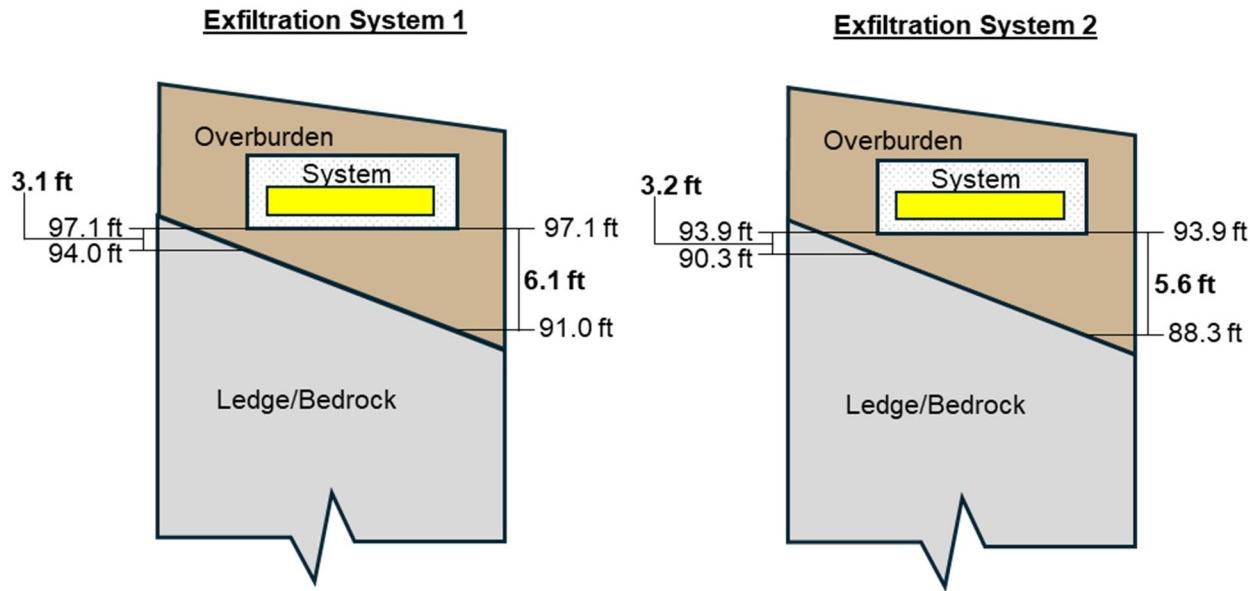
Cross Section Elevations Exfiltration Systems (Not To Scale)
